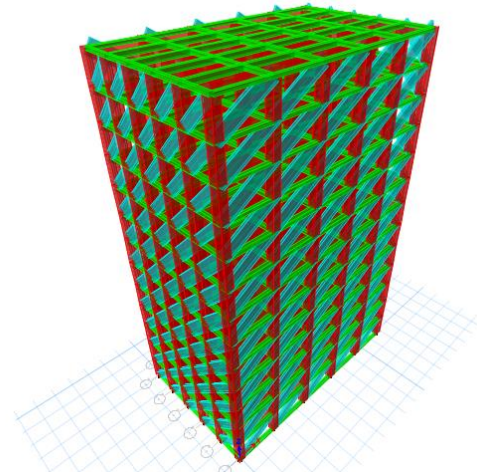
Three dimensional view of G+12 Building with infill(brick and AAC)
